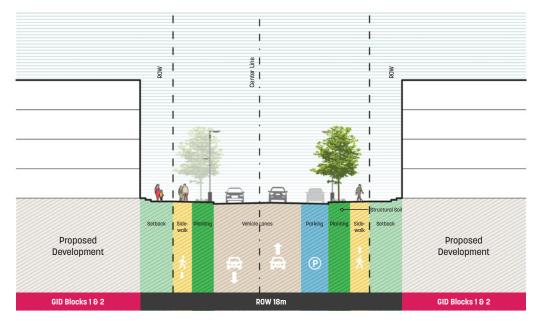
Typical local street cross section (Sasaki, April 10, 2024)
